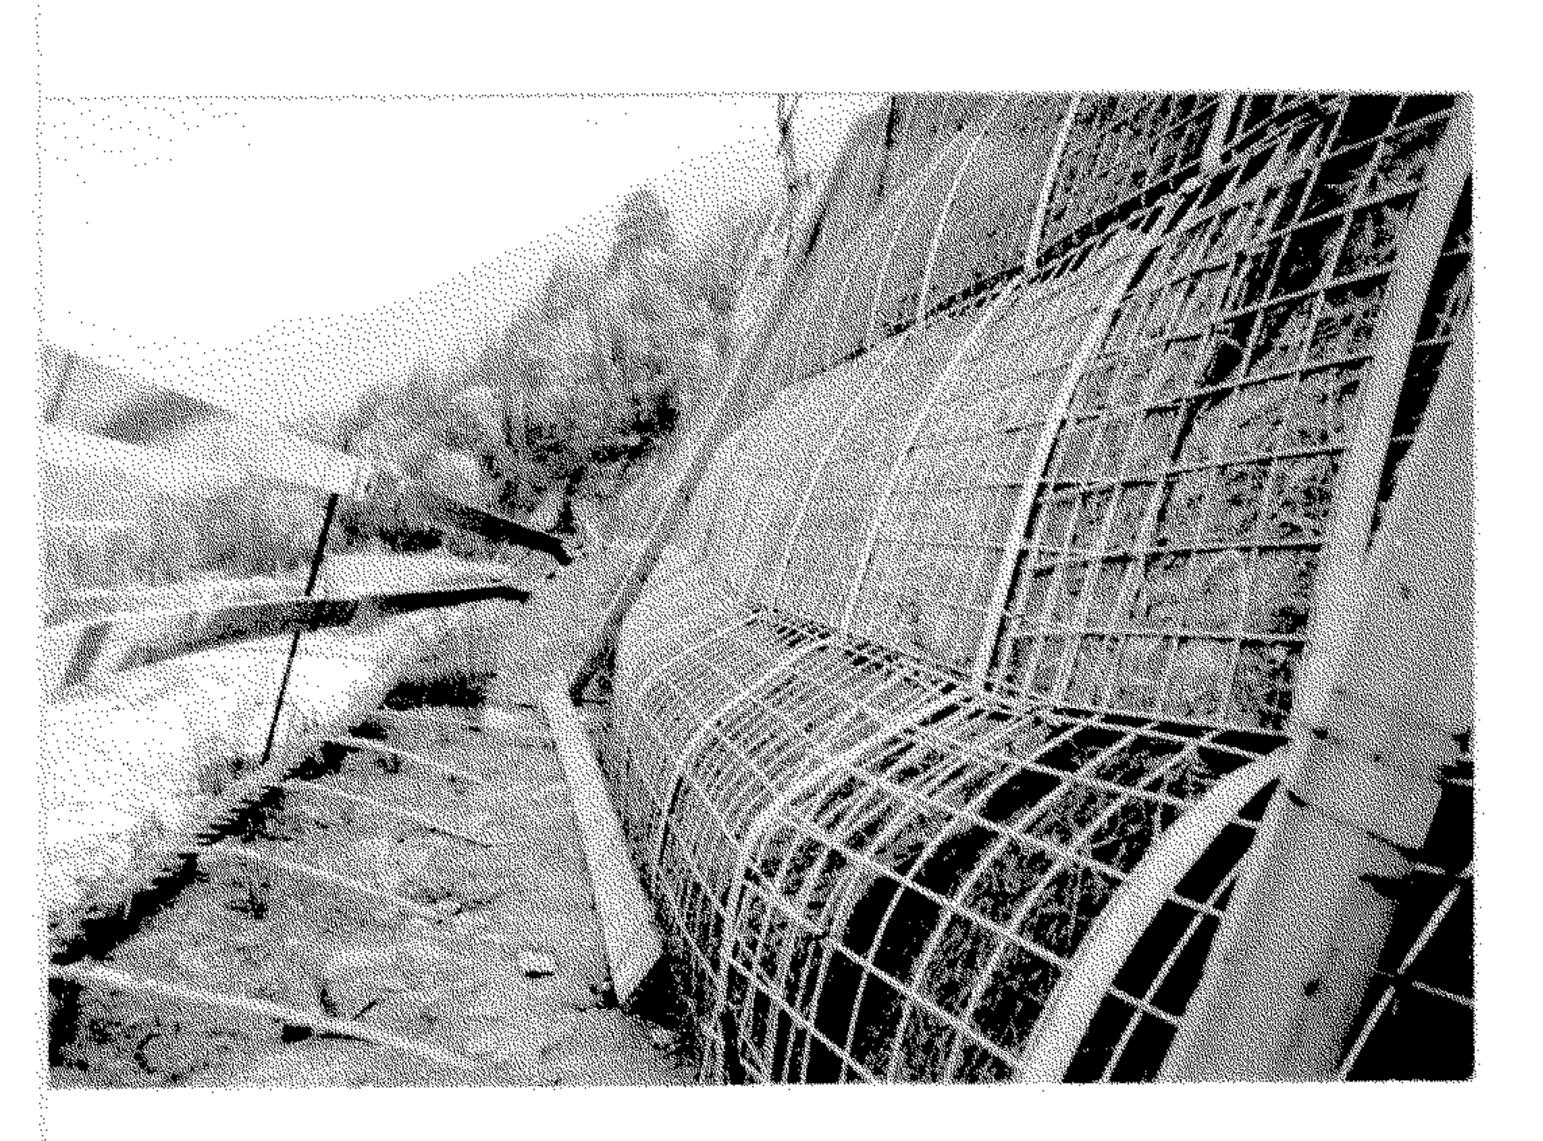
View of a distressed face of a GRSS structure with bulging of the welded-wire form and loss of fill material.
